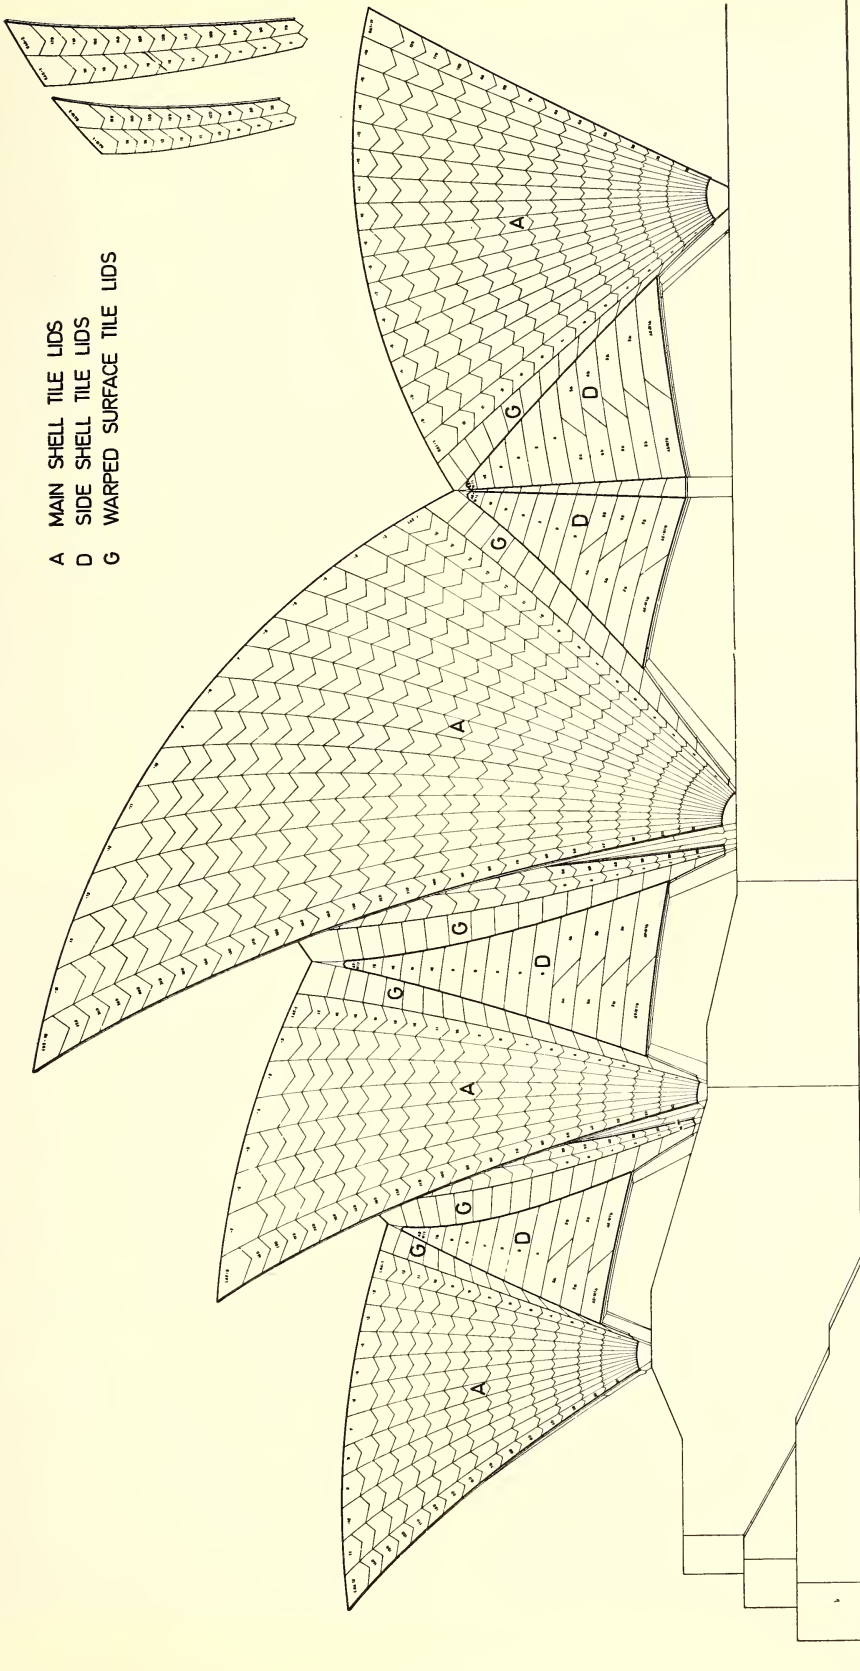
Western elevation of Concert Hall showing arrangement of tile lids.
